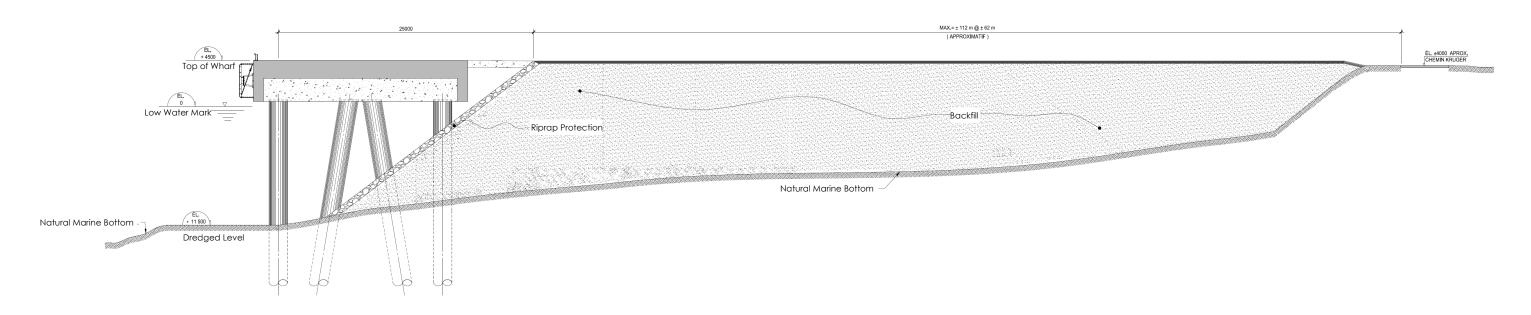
Cross-Section - Option 4 Slab on Pile with storage
